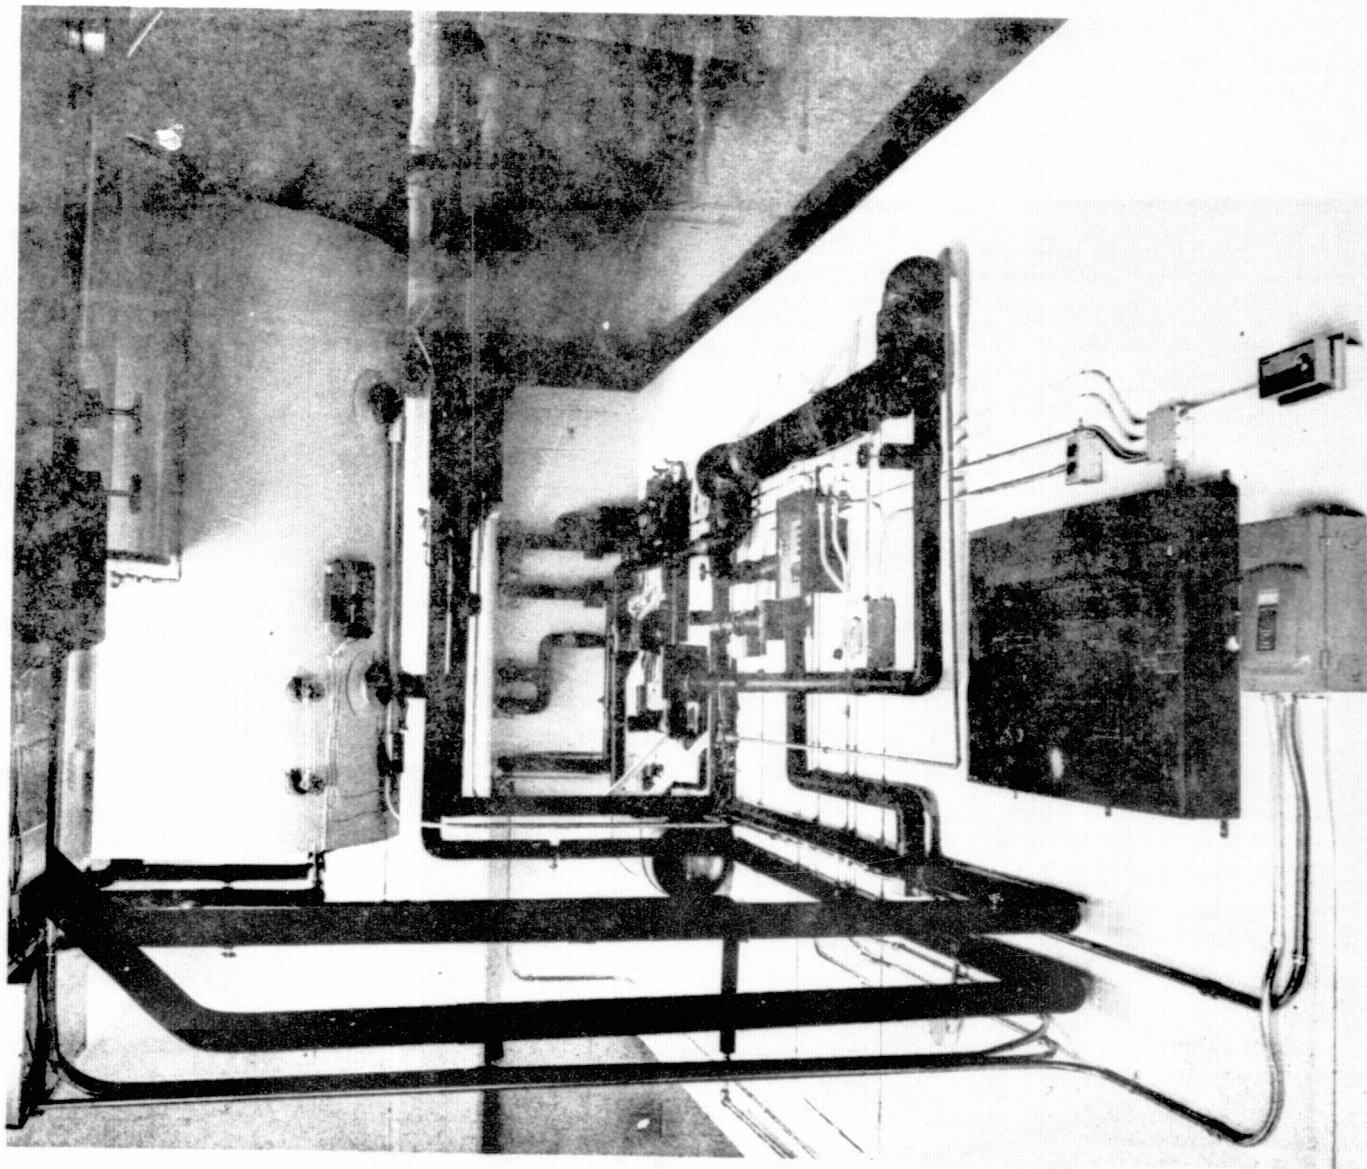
Lennox Solar System Indoor Piping Arrangement
